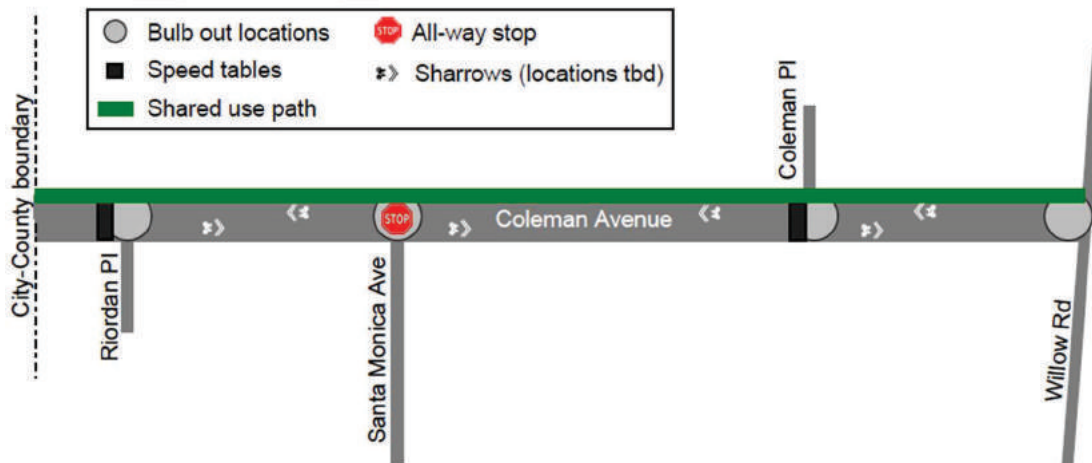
Coleman Avenue (City of Menlo Park) Preferred Long-term Alternative Plan View Schematic Bicycle Boulevard with Shared Use Pathway and Parking on One Side
